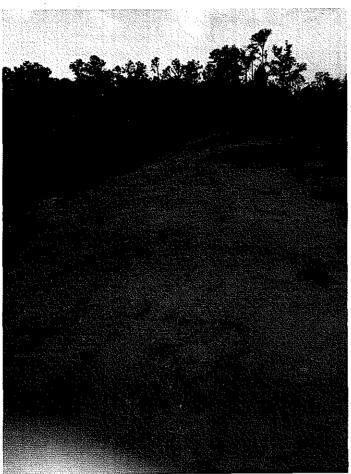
View of erosion control stretch facing southwest on eastern portion of OU1. (June 3, 2010)
